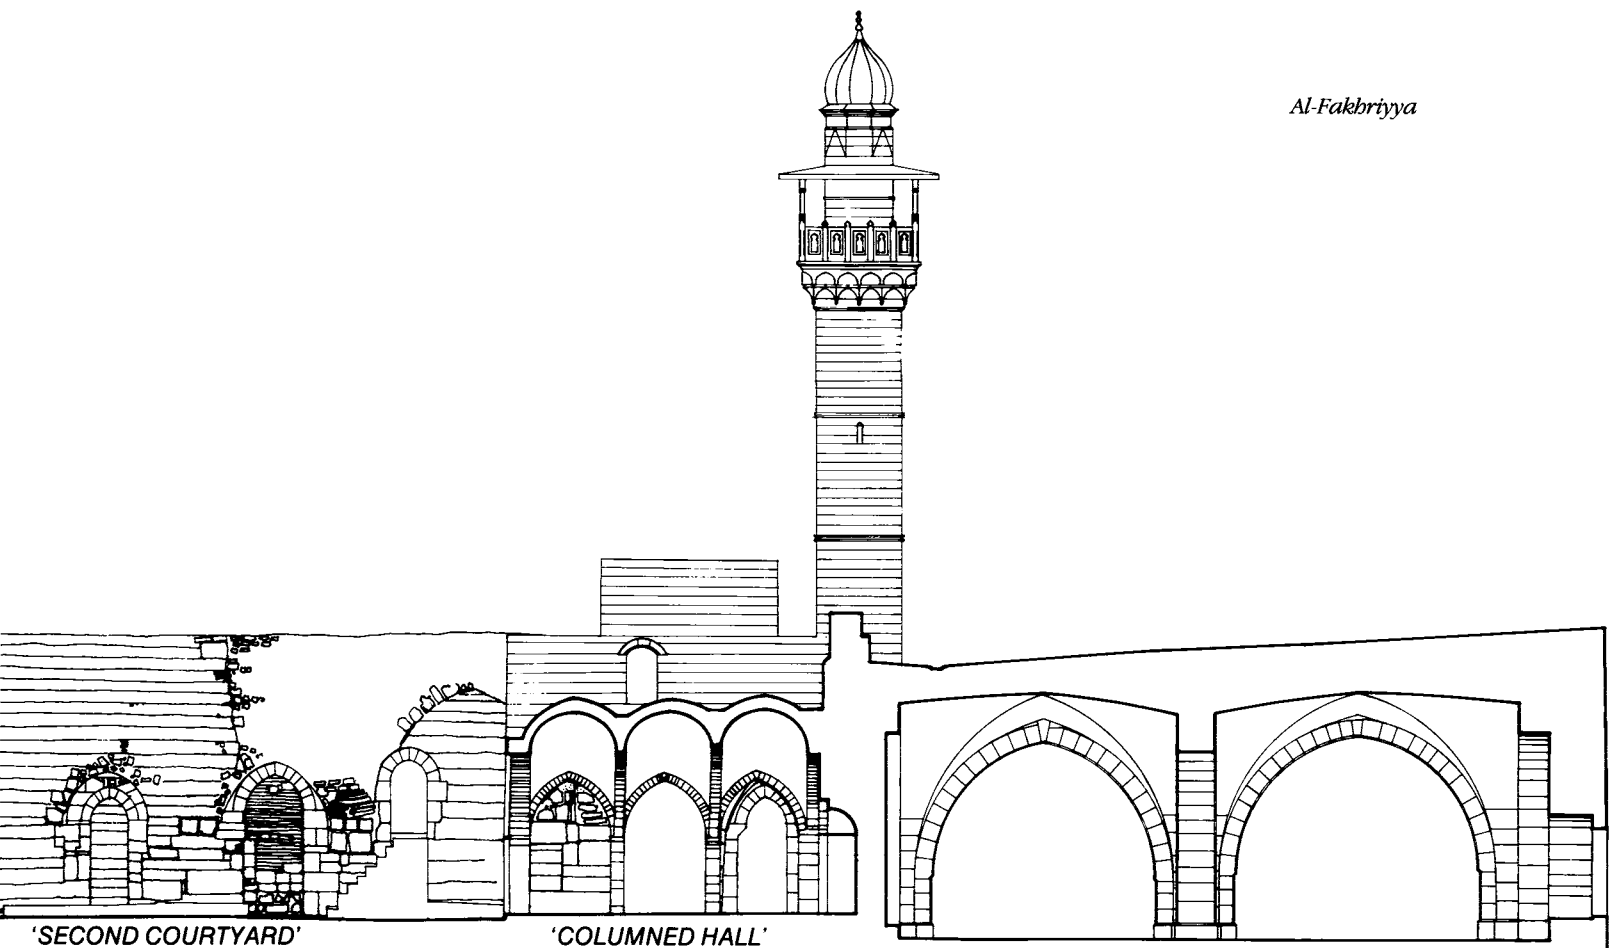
East-west section through Jāmi' al-Maghārība and columned hall looking south
